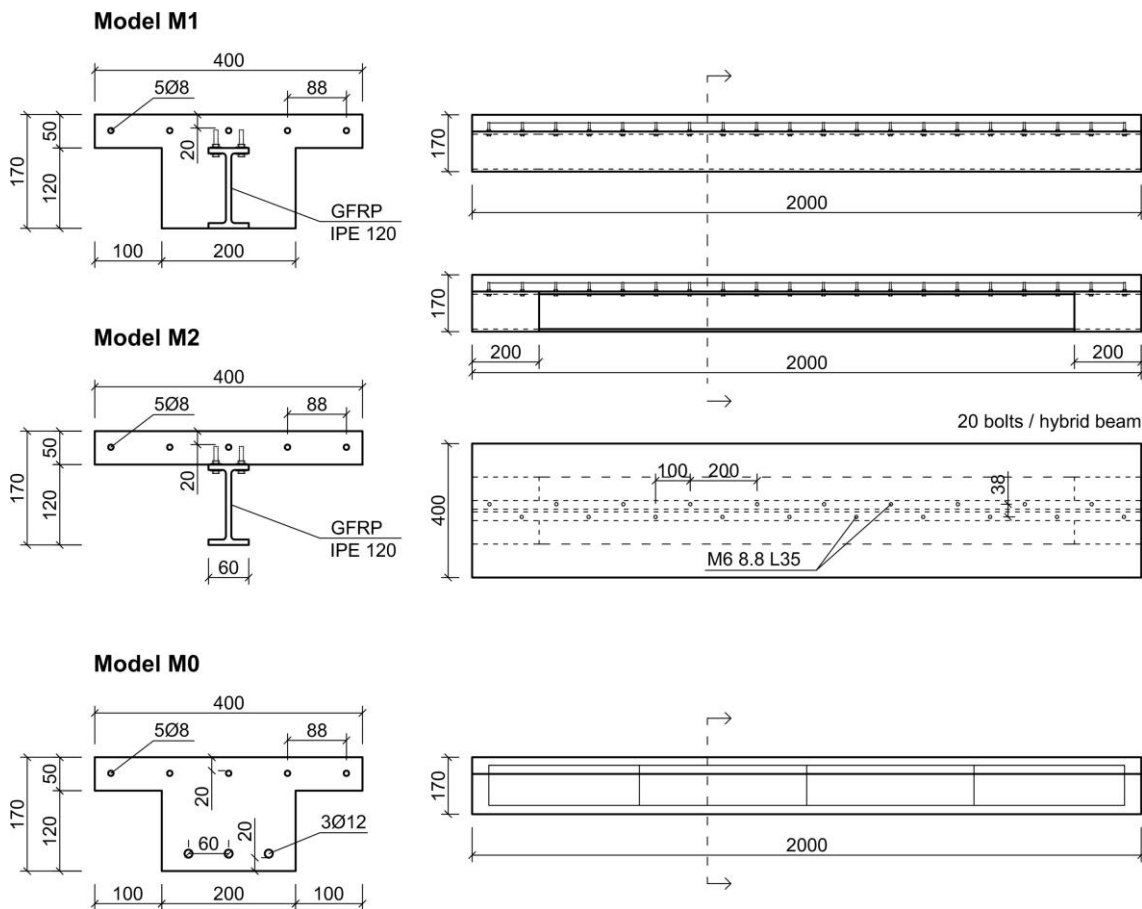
Constructive details of the proposed models: cross-sections, lateral views and combined top view of M1 and M2 hybrid beams (mm) – not to scale.
